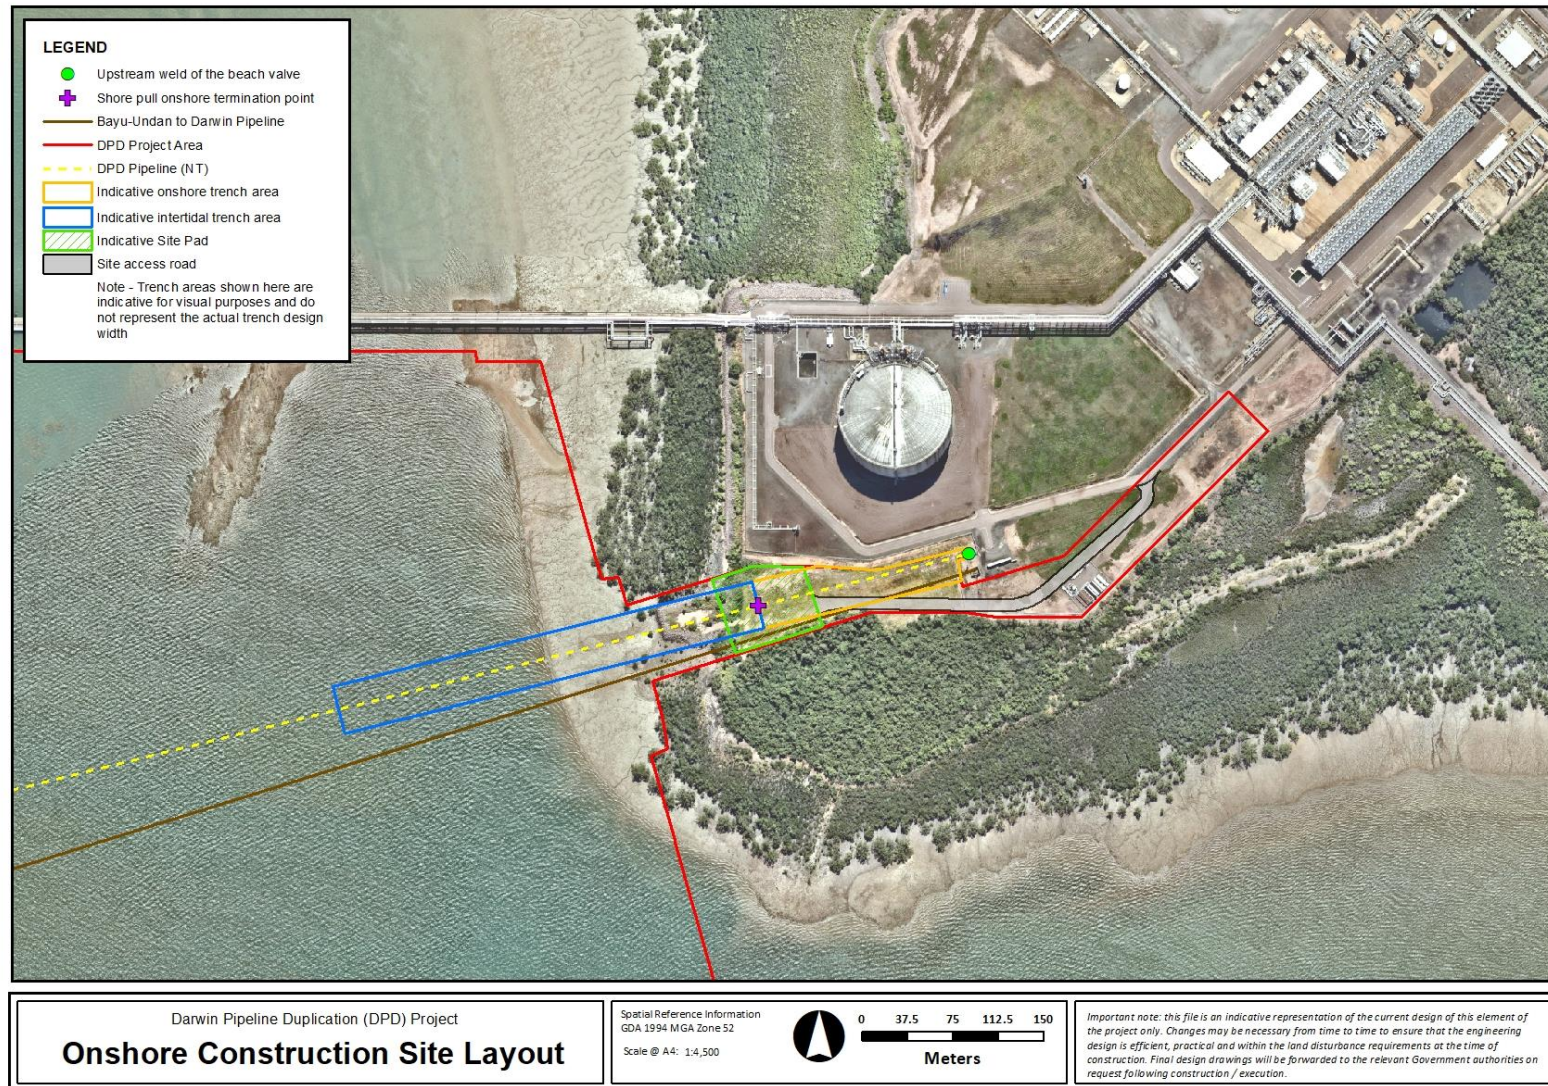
Onshore site layout and Santos Barossa DPD Project teams shore crossing at the intertidal area
